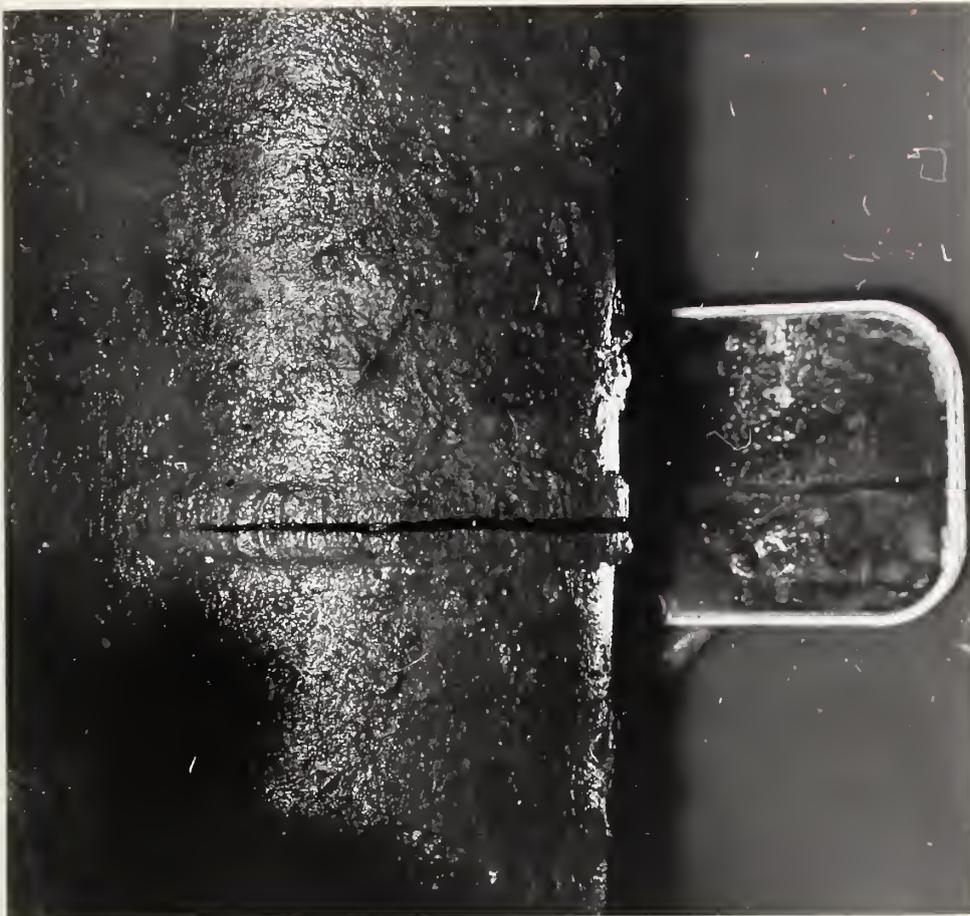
Part of the welded steel gas main pipe still in the ditch showing the crack in the weld. A mirror had been placed to the right and near the bottom of the pipe in order to show that part of the crack which extended to the pipe bottom. This photograph was taken looking straight down on the pipe, and was furnished by and used with permission of the Pennsylvania State Police. Approx. X 3/8
